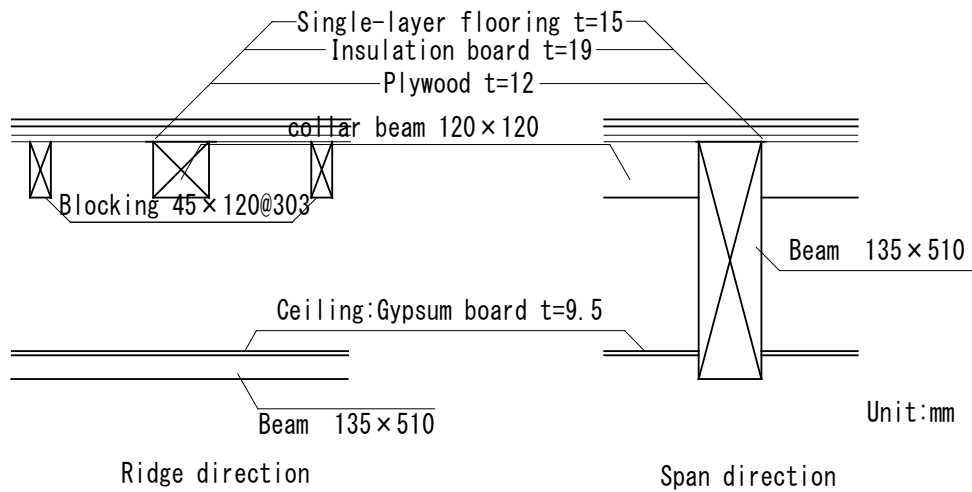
Upstairs floor cross-sectional diagram of elementary school C.
